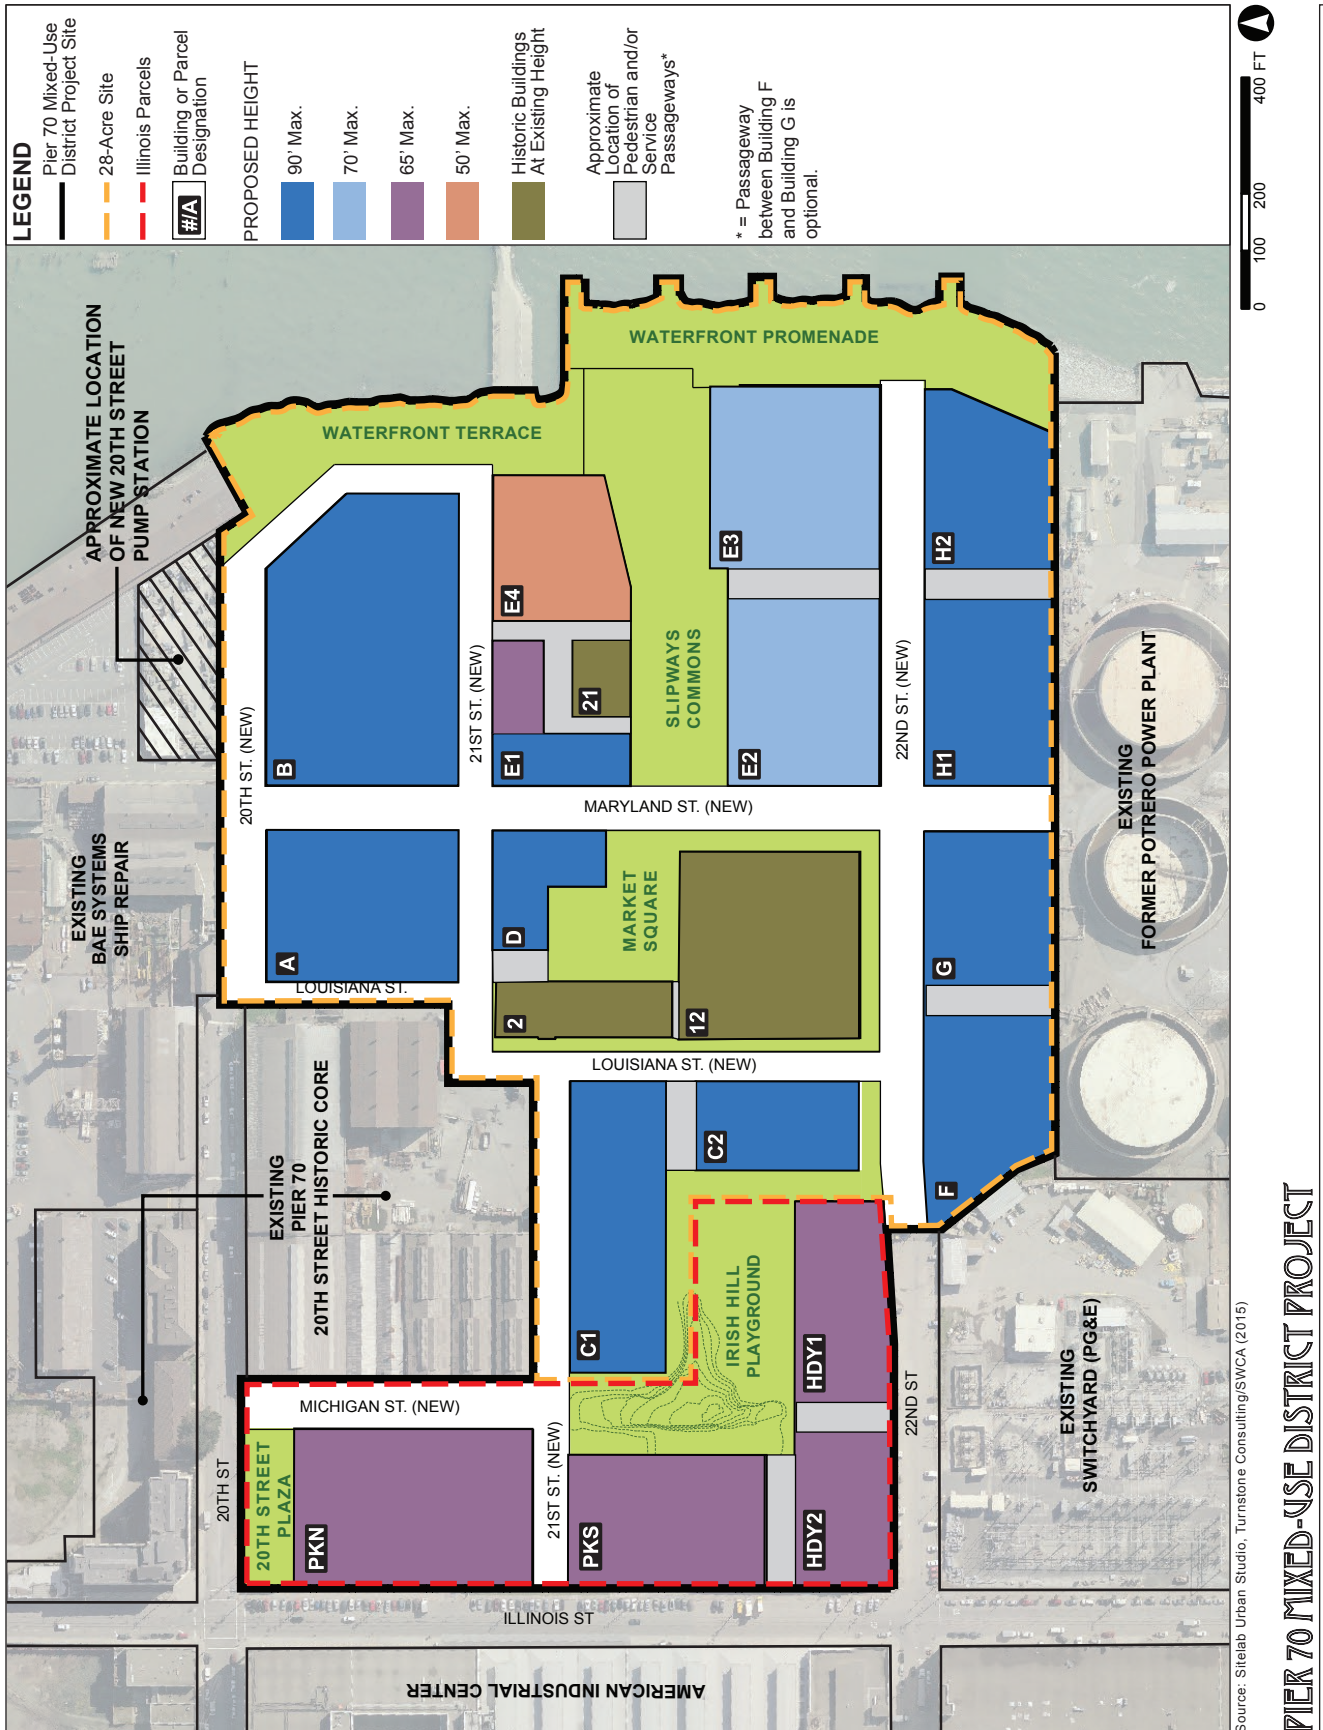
PROPOSED HEIGHT LIMITS PLAN
